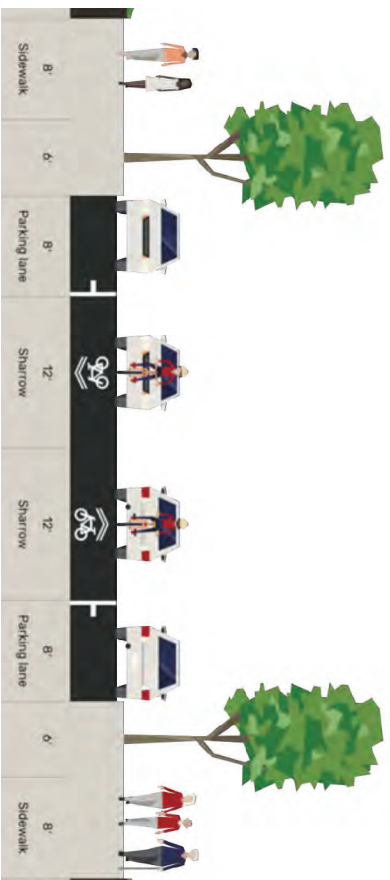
D: PROPOSED COLLECTOR – INDUSTRIAL STREET CROSS-SECTION (SOURCE: STREETMIX)
